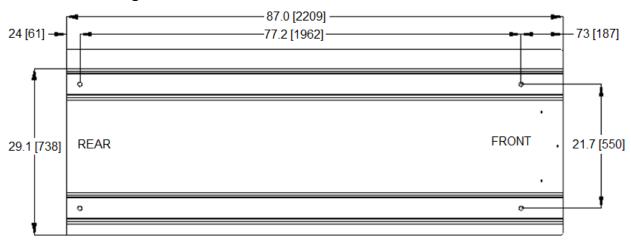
Benchmark 5000-6000 Anchor Bolt Locations
